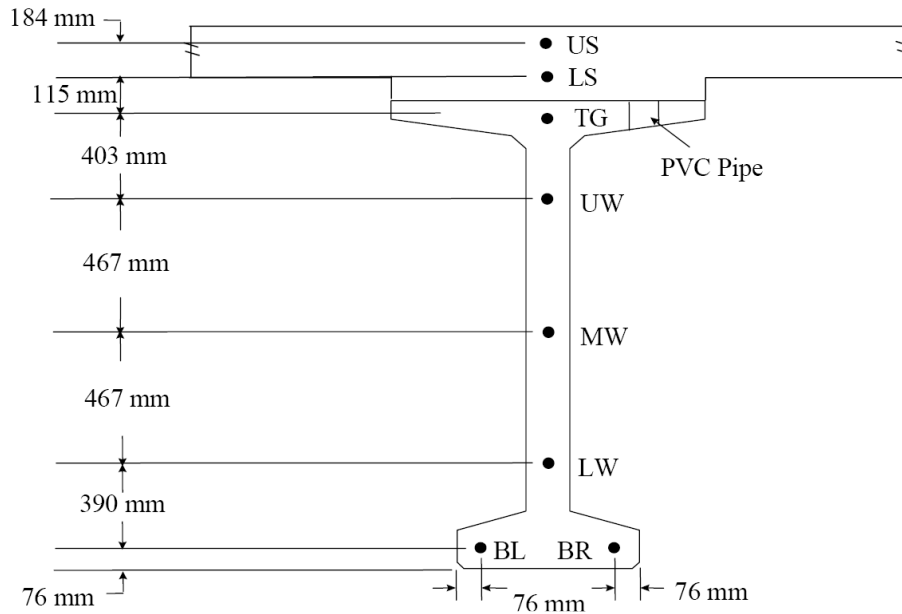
Location of VWSGs installed on a Washington W74MG girder cross-section (Barr, Eberhard et al. 2000)
